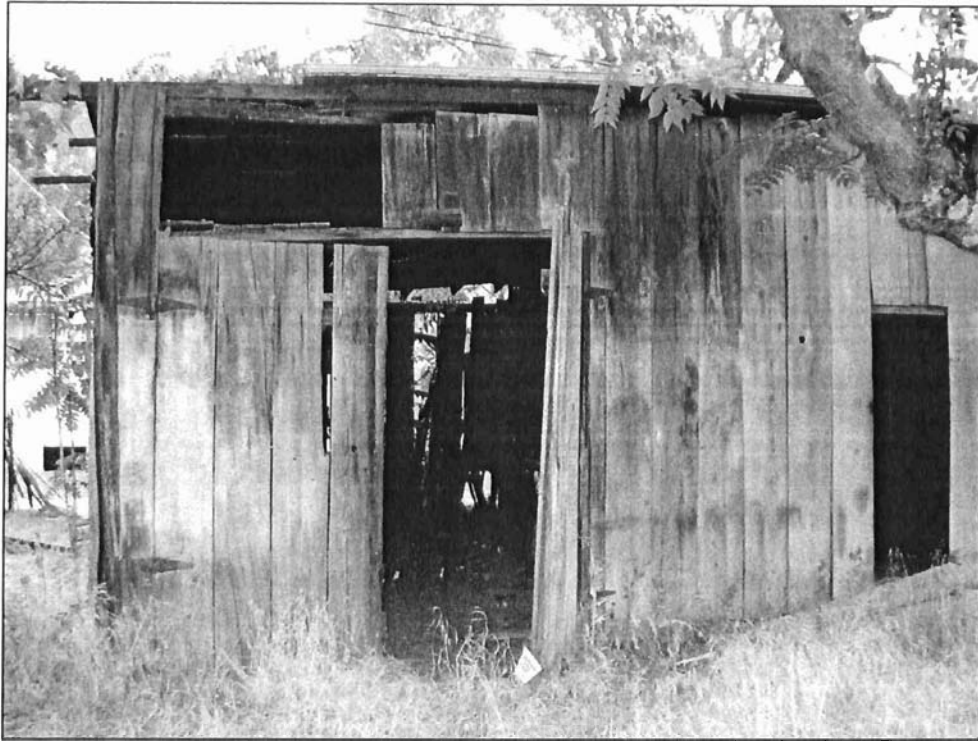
Oldest portion of the garage at 719-721 Pine Street
